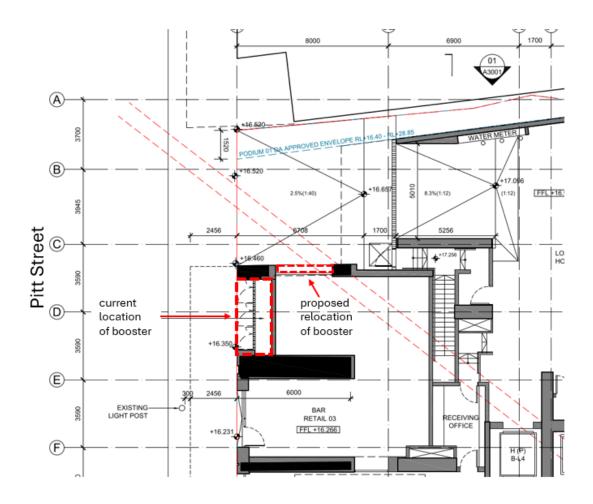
proposed ground floor plan with current location of hydraulic booster and proposed relocation
